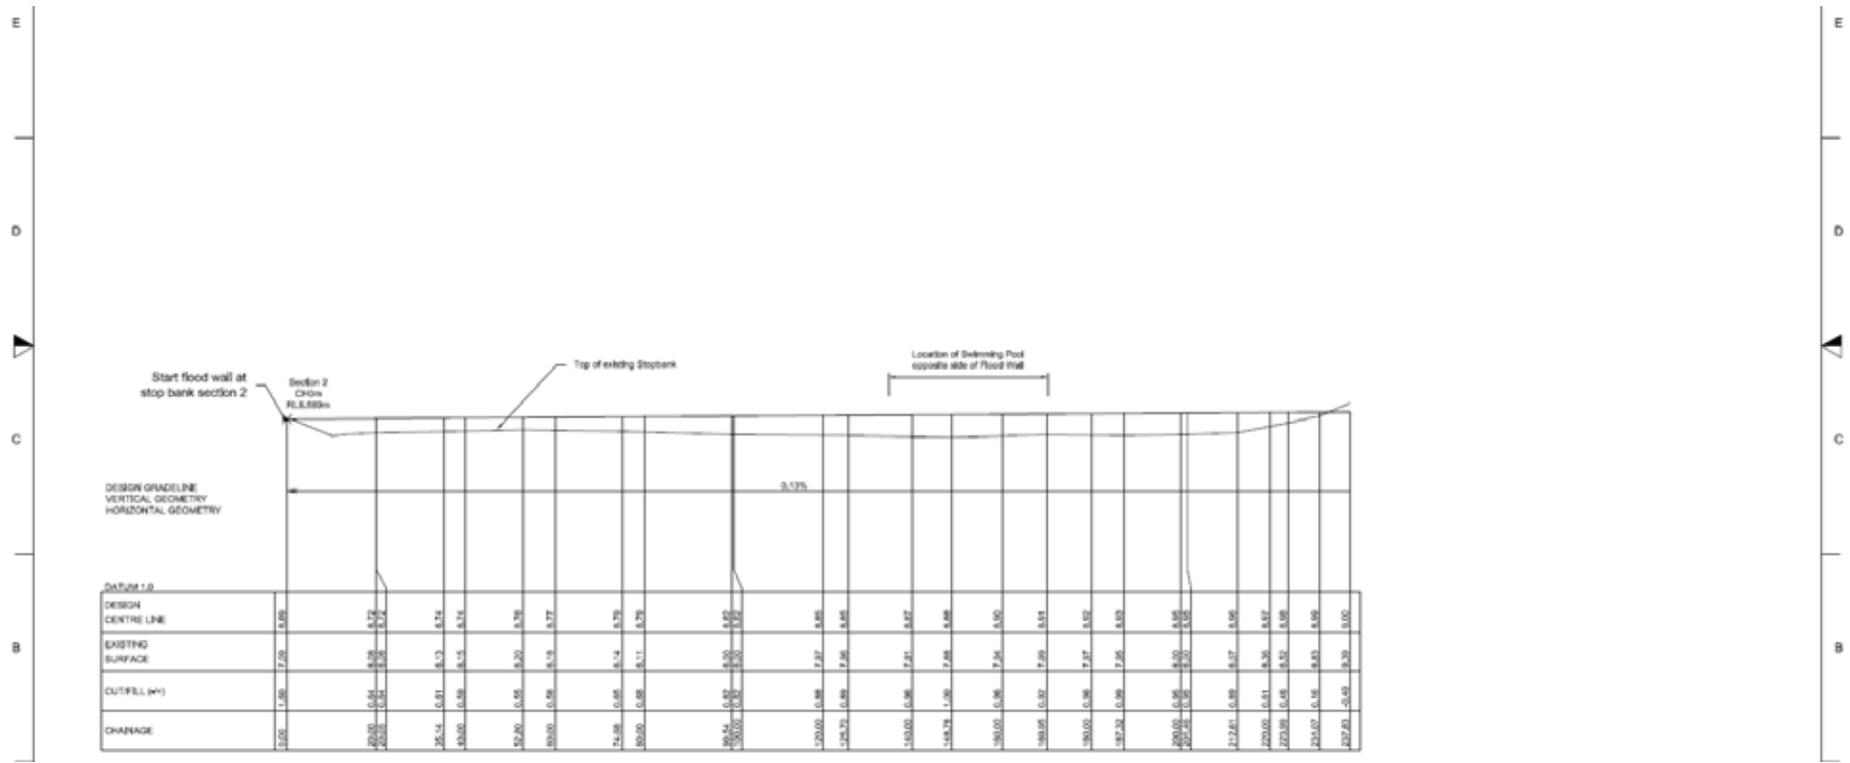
Longitudinal Section 2A Stage 1 Timber Pole Flood Wall
